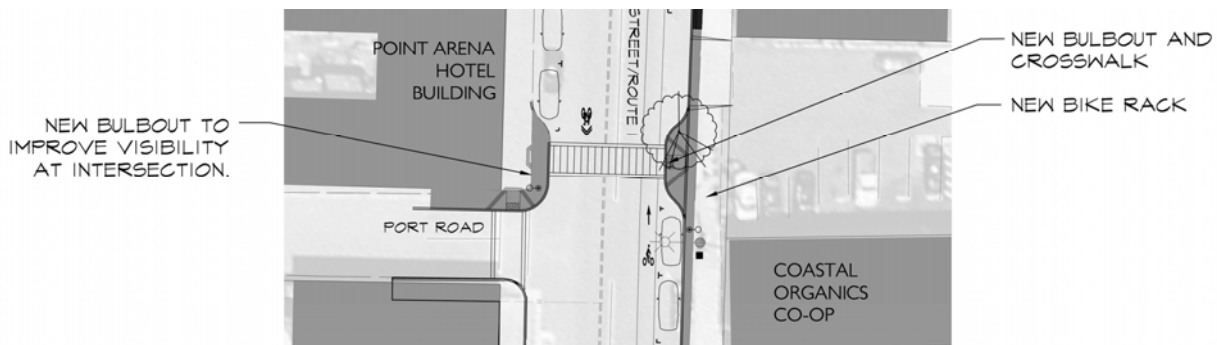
Proposed Intersection Treatment at Main Street/Port Road
